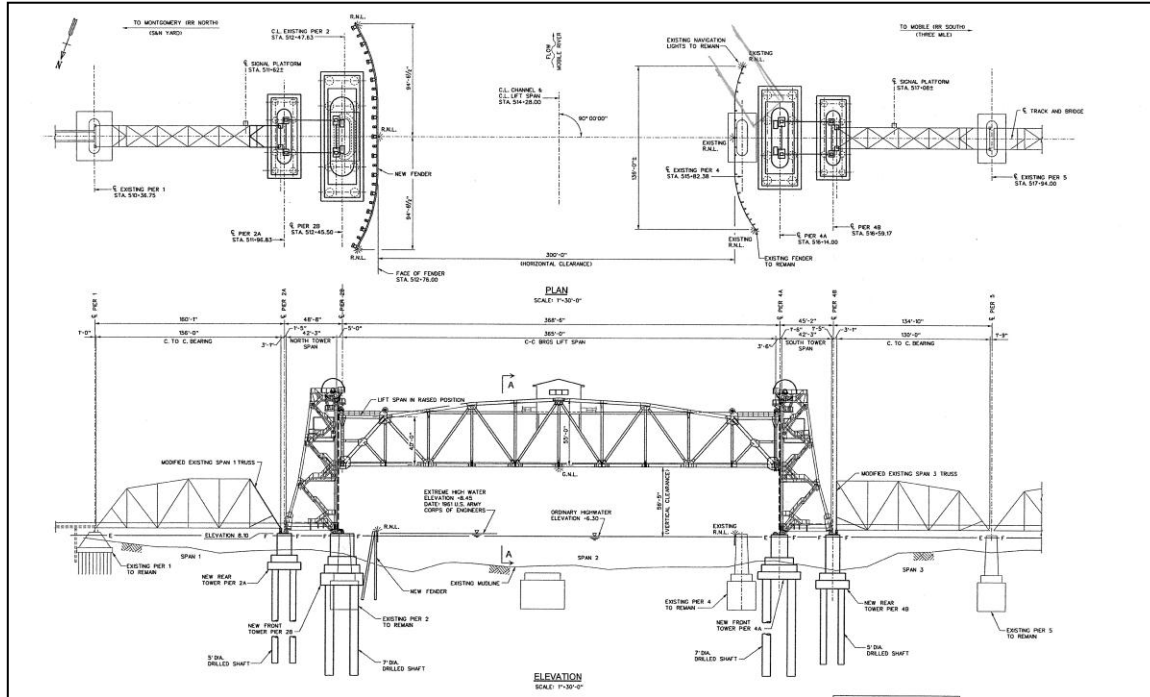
General Plan and Elevation of Proposed Replacement Structure (CSX Plans, 2006)
